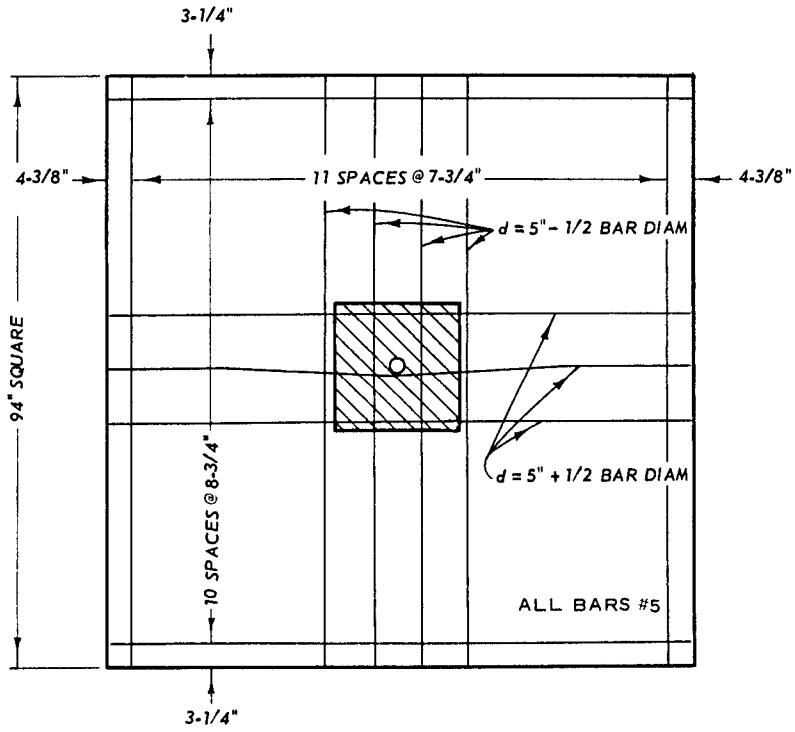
Slab reinforcement for 4075 Series specimens.
